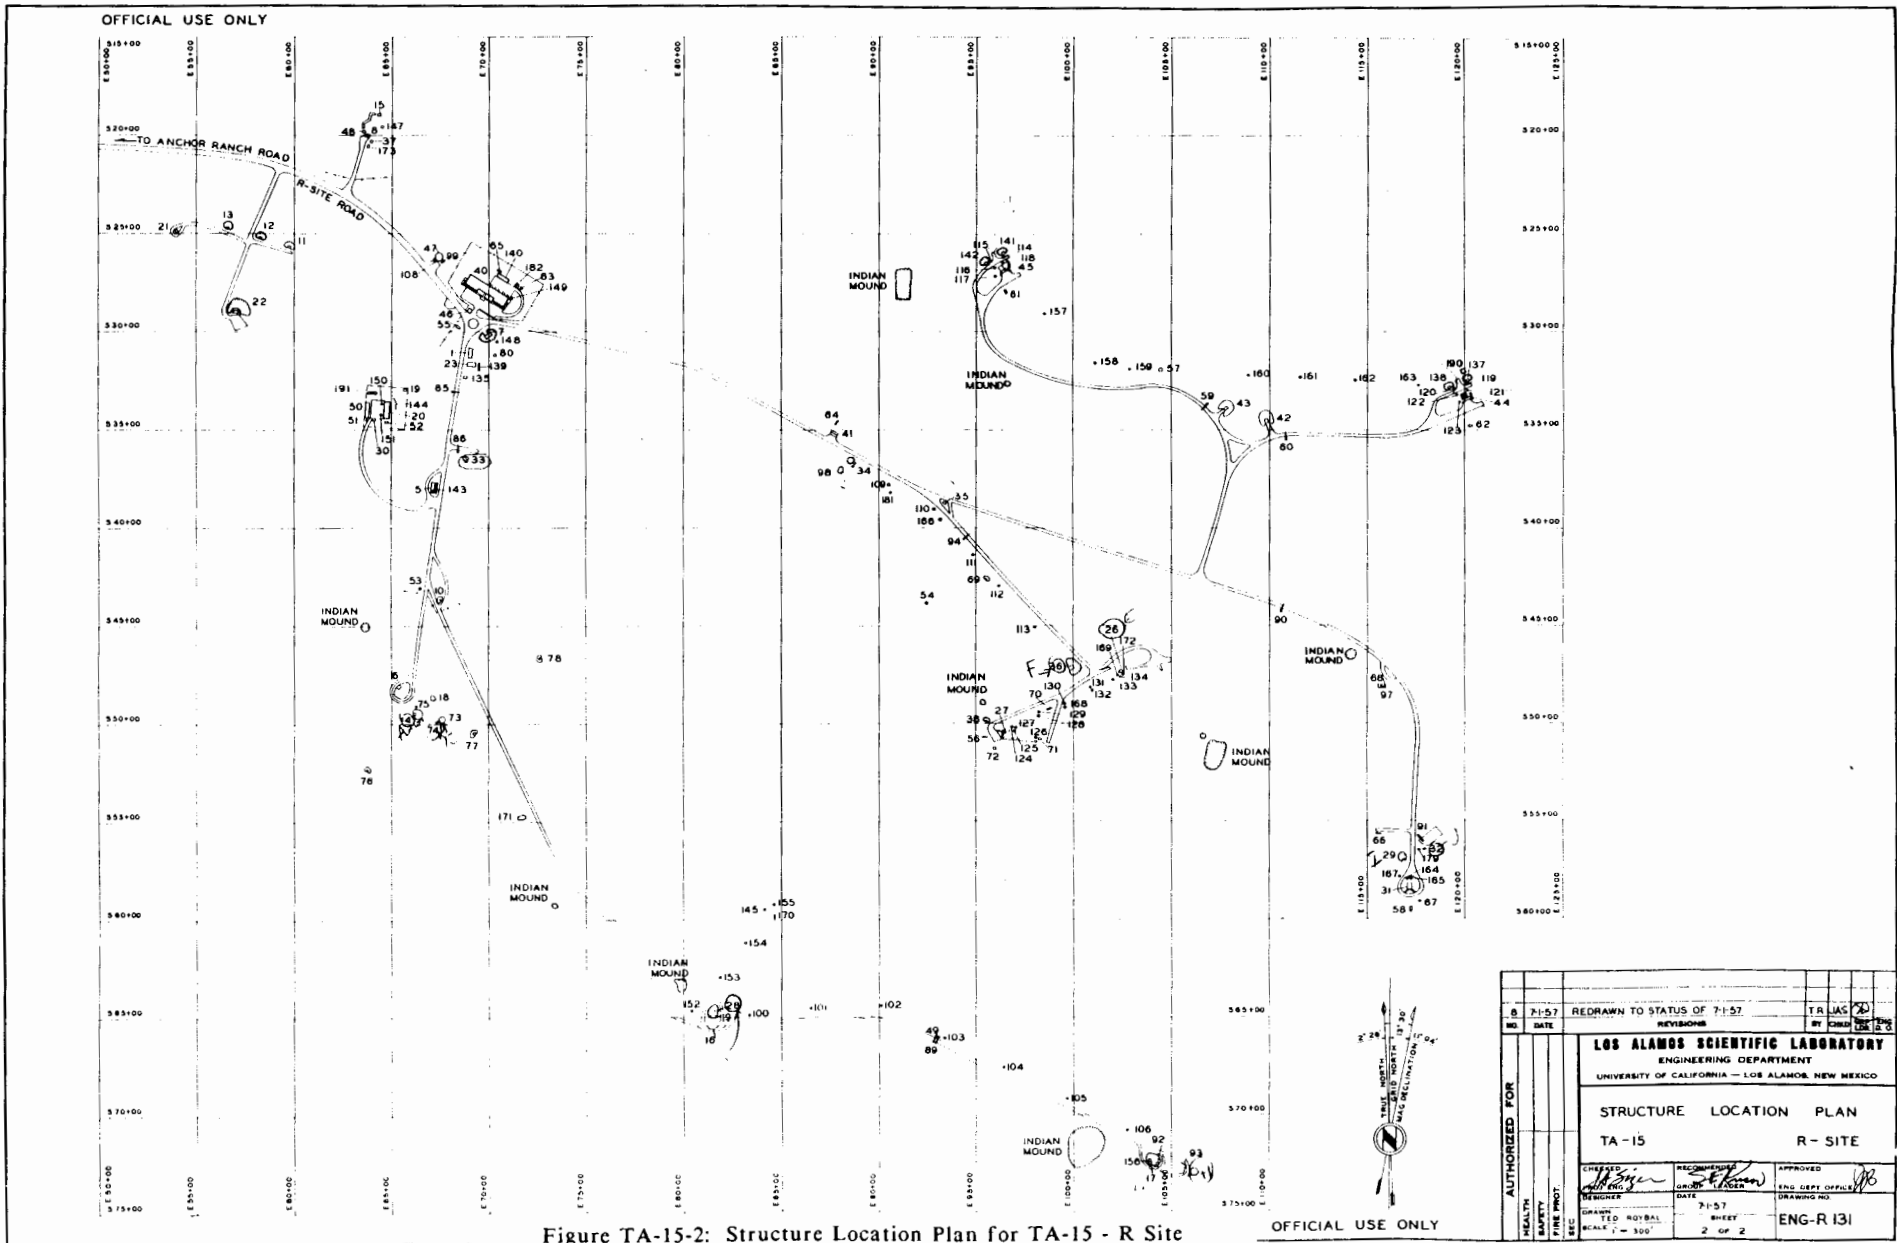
Structure Location Plan for TA-15 - R Site
